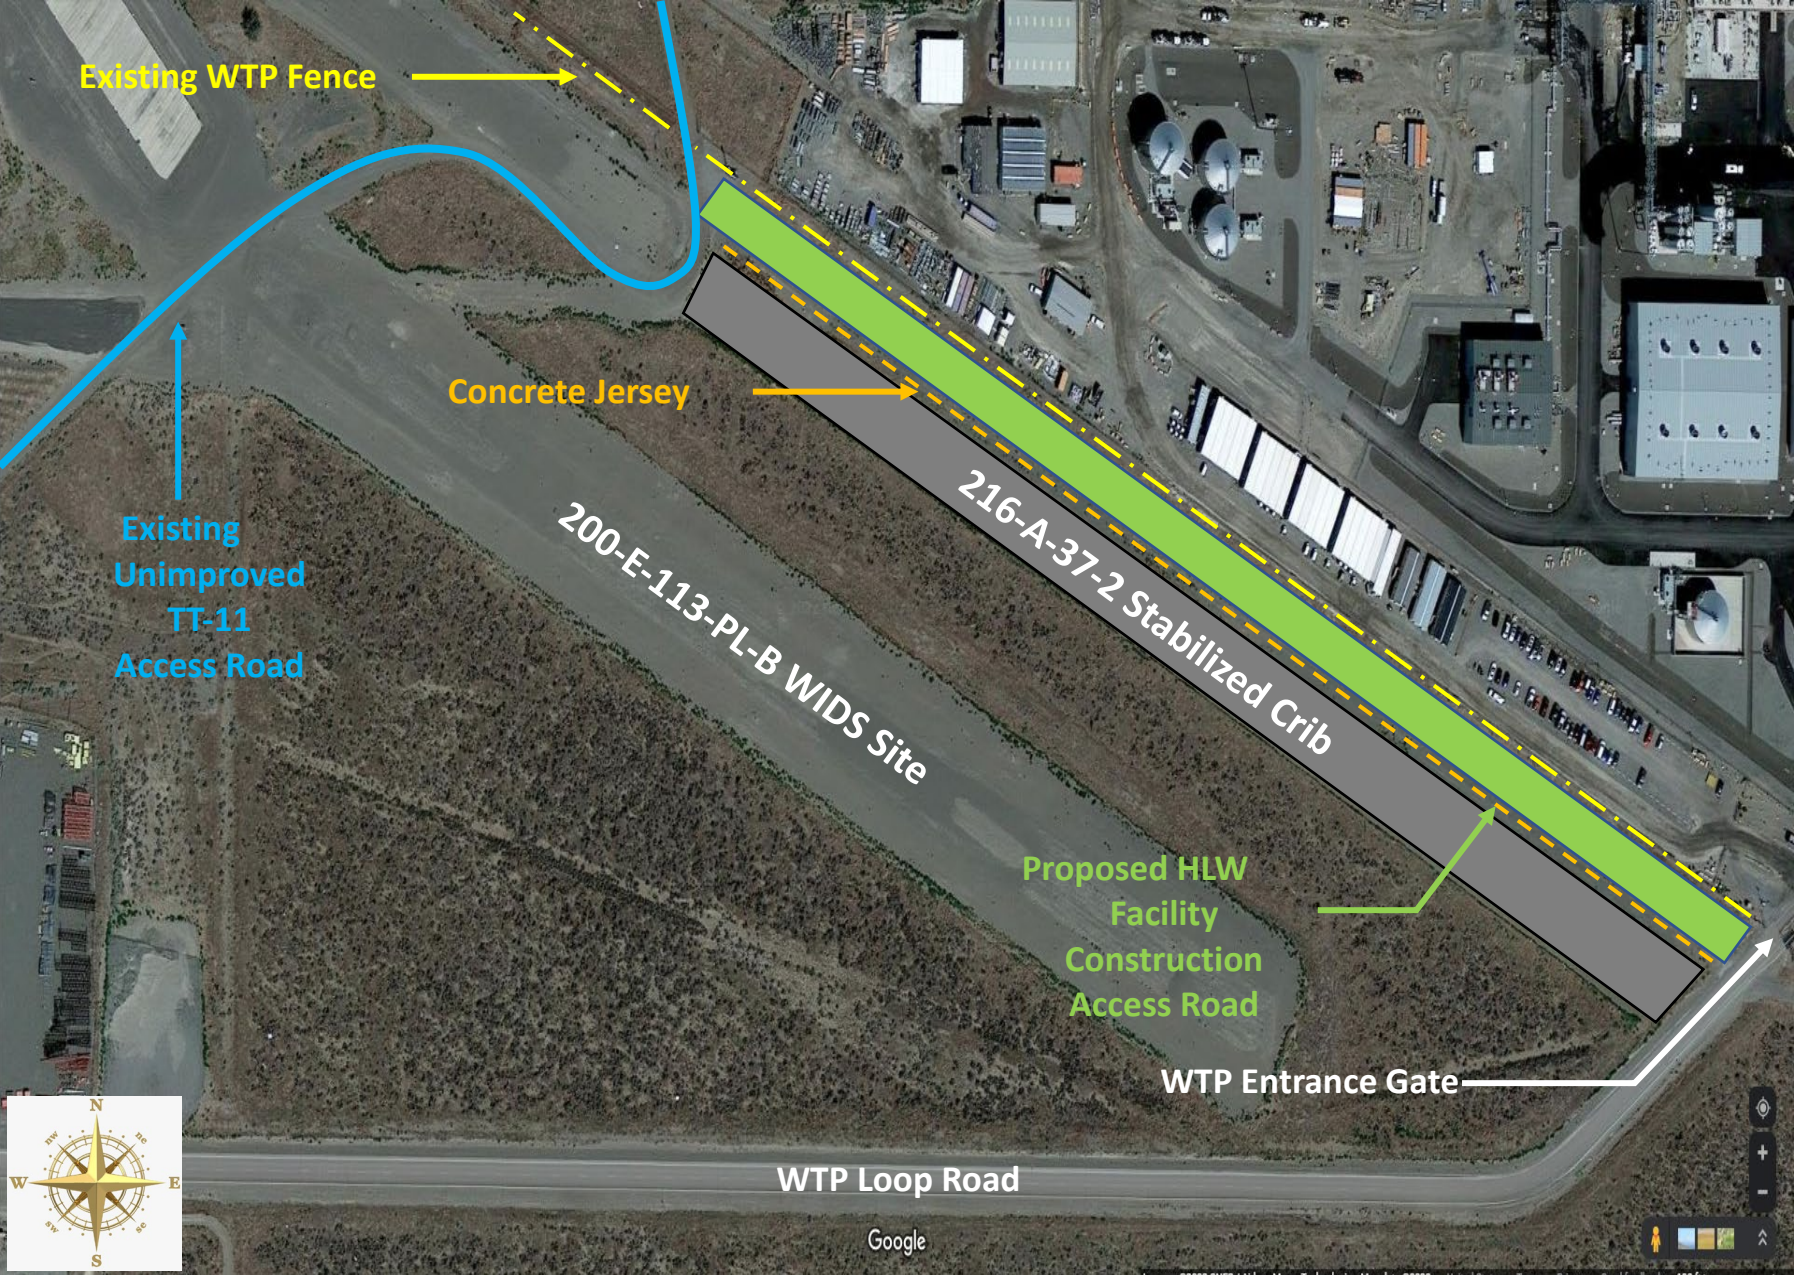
Proposed HLW Facility Construction Access Road (Looking Northwest from WTP Loop Road)
